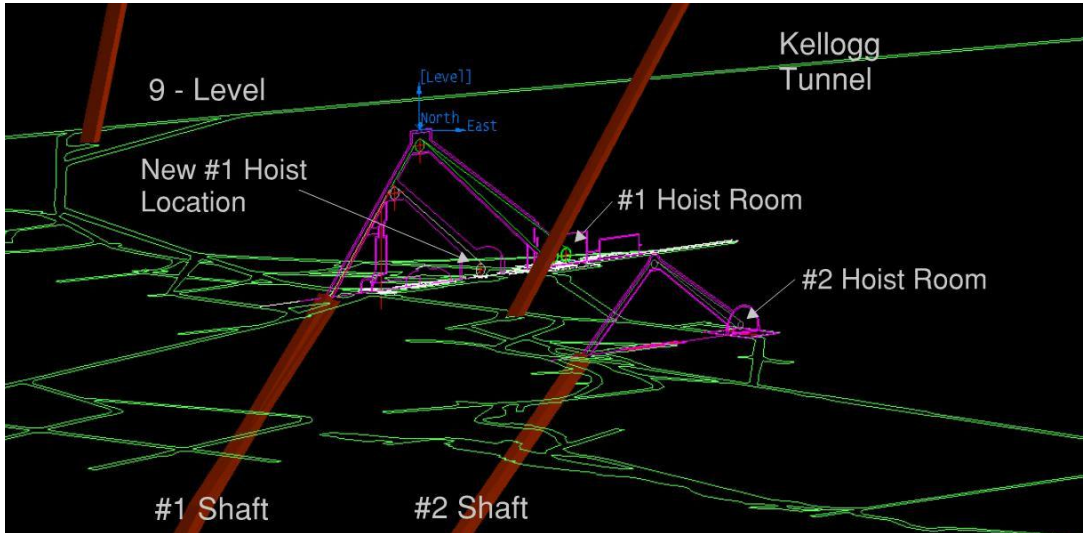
#1 & #2 Hoist Rooms Area View Looking North-Northwest
